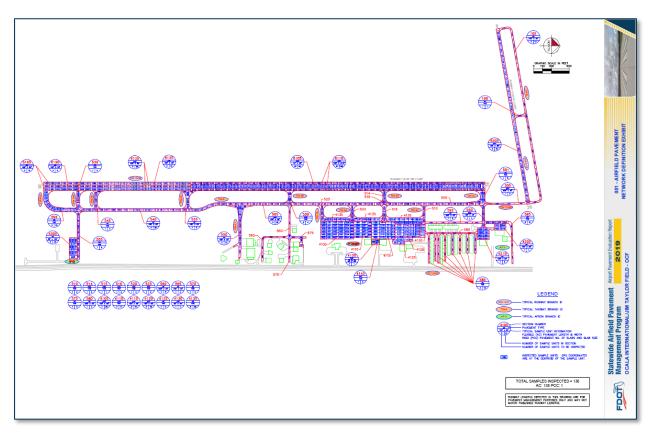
(a) 2019 Airfield Pavement Network Definition Exhibit
